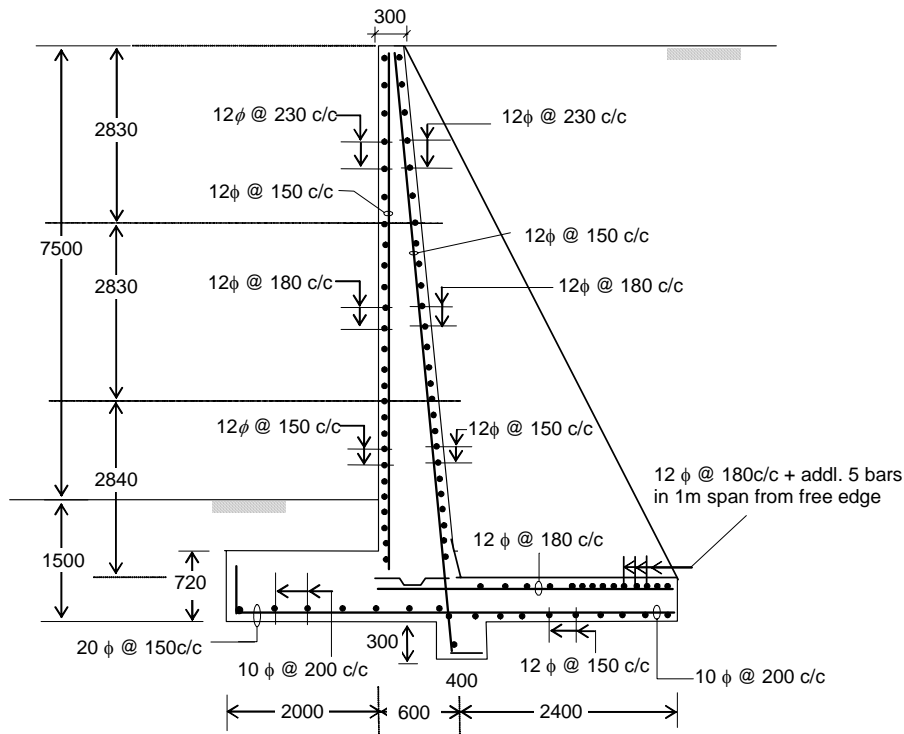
Reinforcement details of stem, toe slab and heel slab
